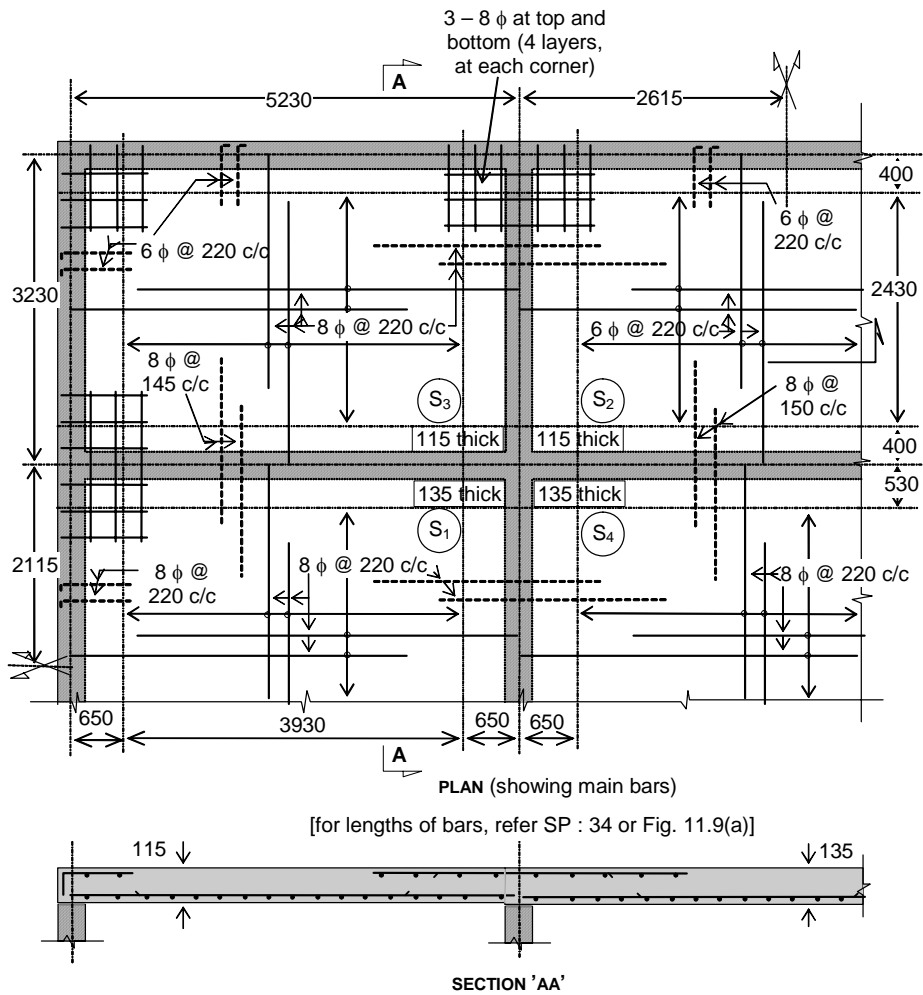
Detailing of multi panel slab system — Example 11.3
